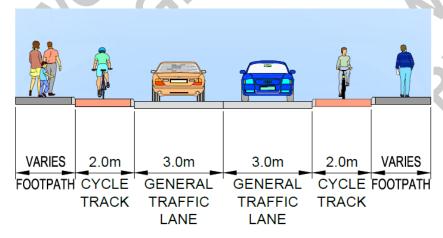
Section 1, Proposed Option 2 - Cross Section B-B
